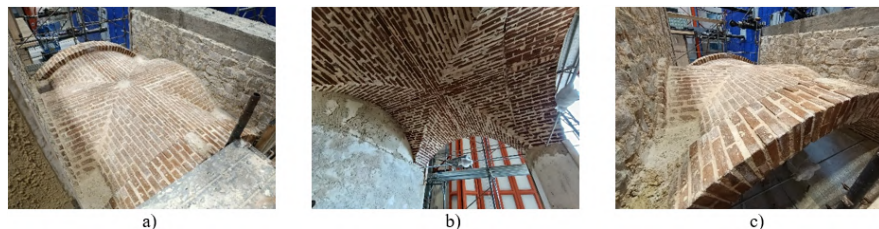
Construction details and views of the vault: (a) extrados view; (b) intrados view; (c) detail of the backfill, transverse arch, and separation between the vault and the longitudinal arch (left side of the figure)
